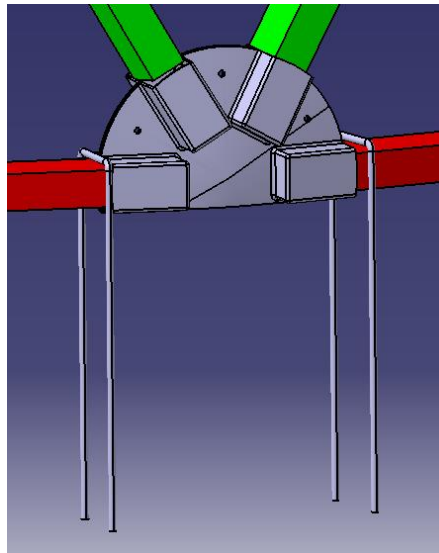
Mounting scheme for structure anchoring to the foundation.
